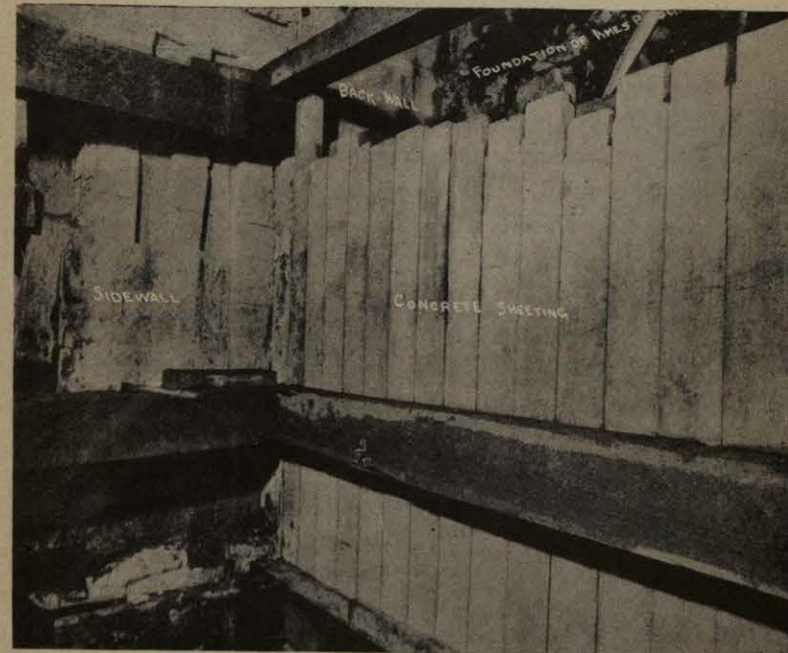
Concrete Sheet Piling in Approaches to East Boston Tunnel. (See p. 653.)
